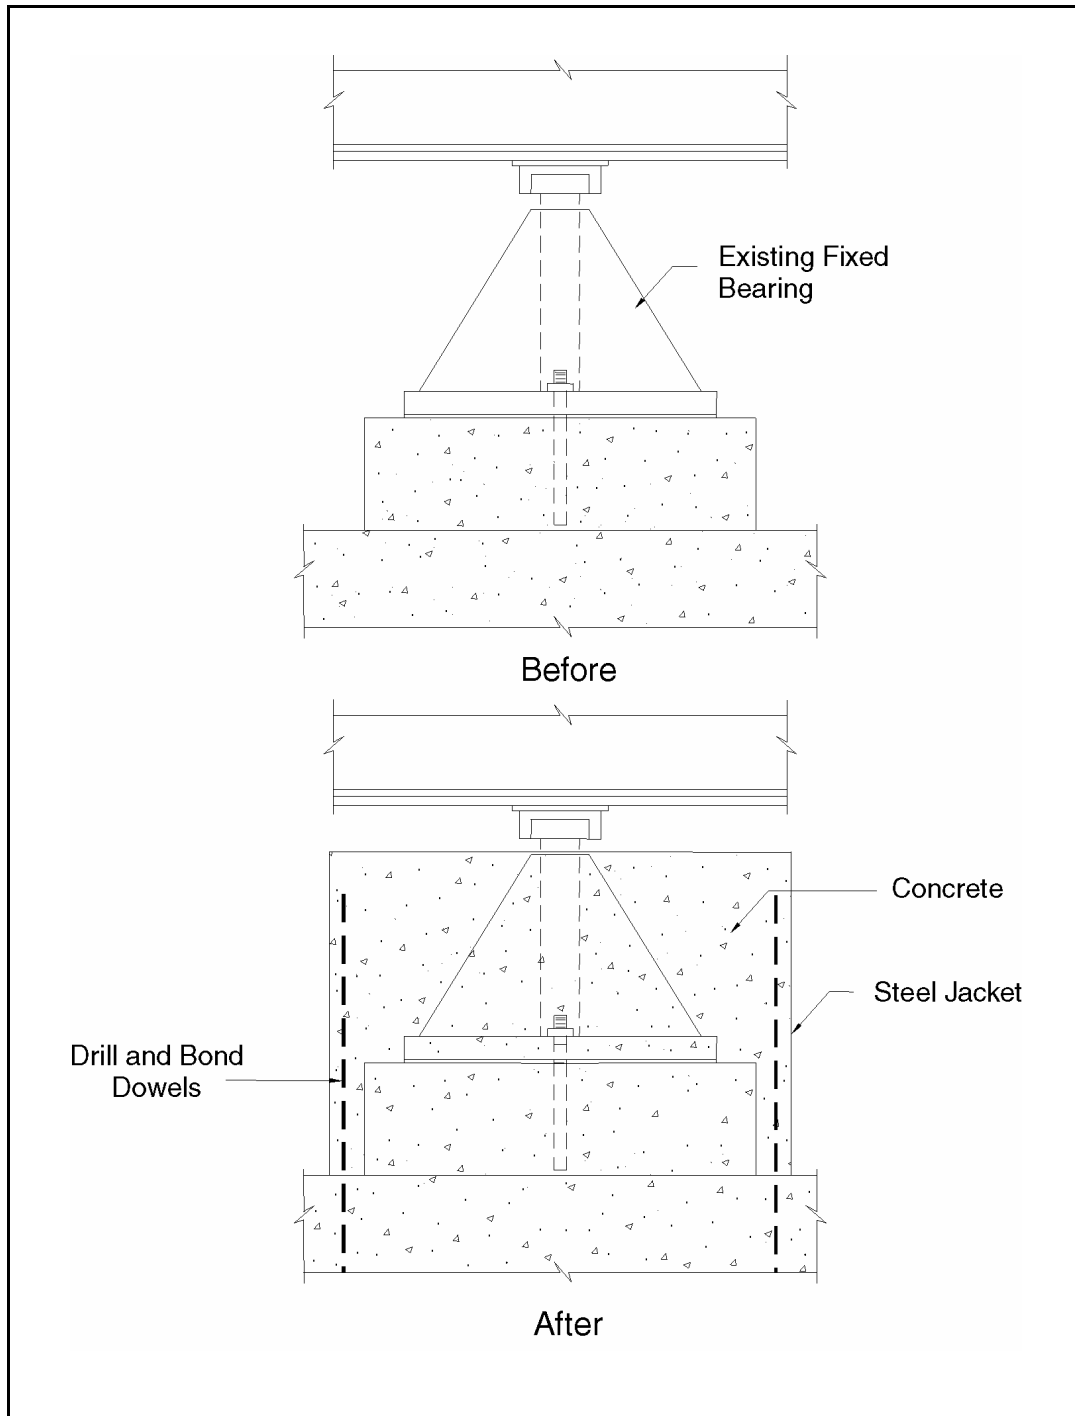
Bearing retrofitting by encasement in steel shell.
